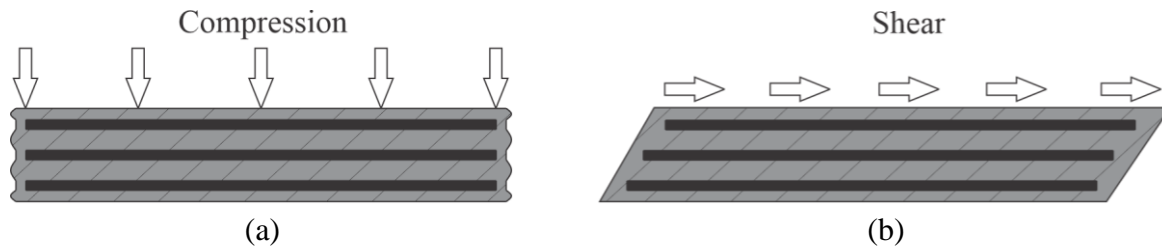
Bearing pads deformation modes: (a) Compression; (b) Shear
